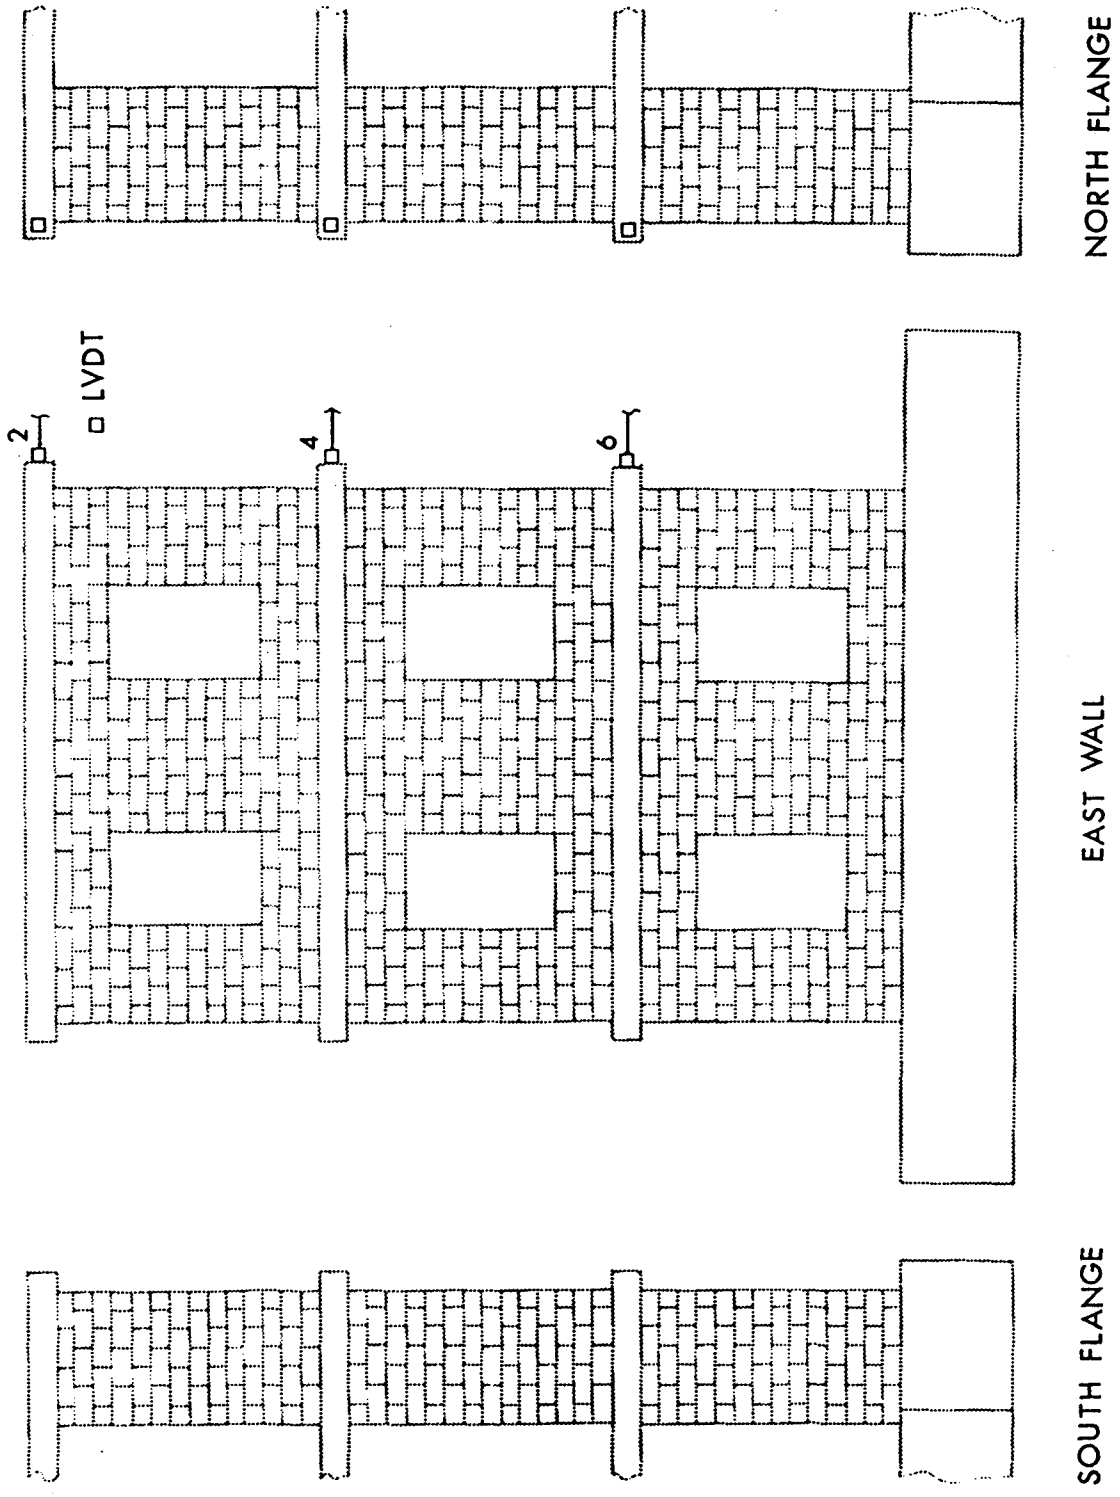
(cont) Layout of Instrumentation (RM2 - Static Test)
